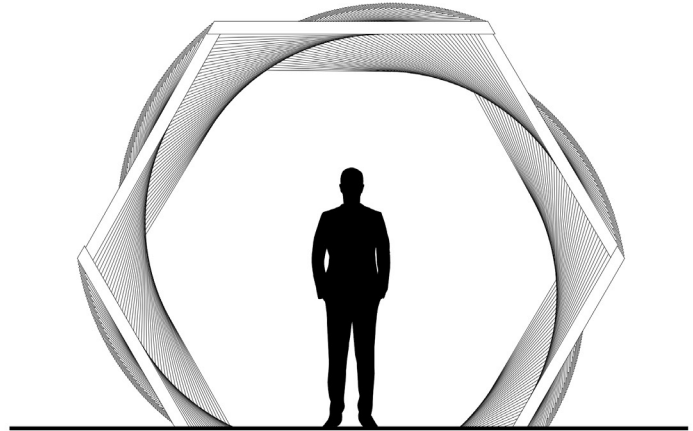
Line work elevations of proposed DLT concept. Photo by Authors
